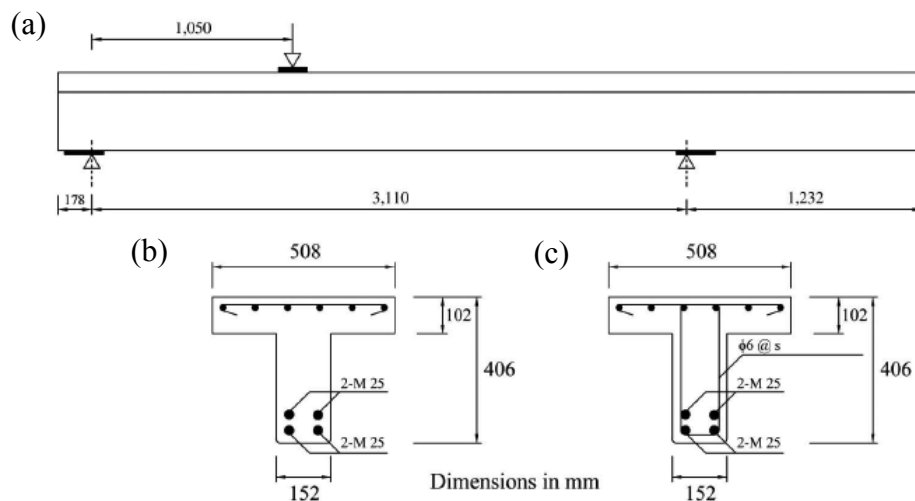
Details of tested beams (Chaallal et al., 2011): (a) Elevation; (b) Cross section with no stirrups; (c) Cross section with stirrups
